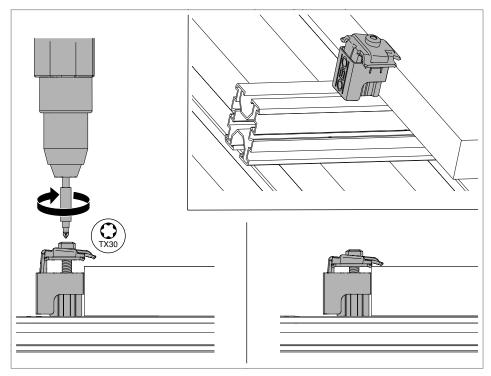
Screwing in the universal clamp as an end clamp on the left
